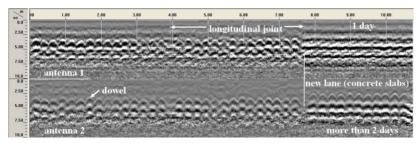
Radargram of dowels positions measurement in concrete road pavement transversal joint by a mobile device
